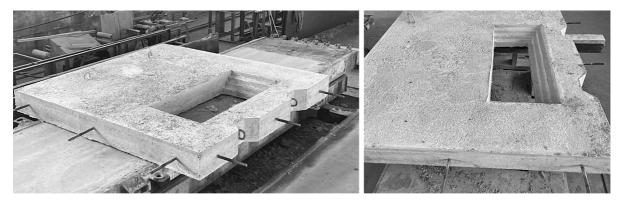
Structural elements of a fortification based on high-strength steel fiber concrete
